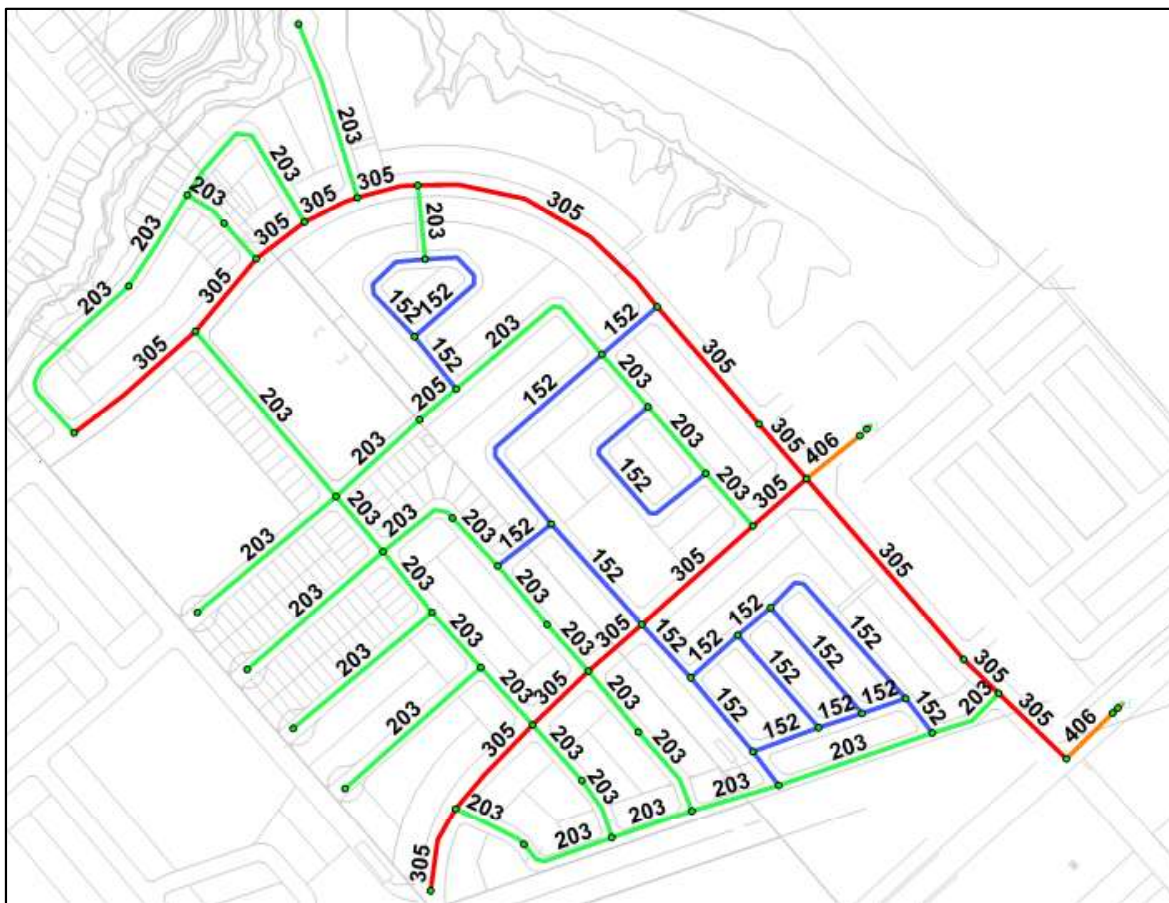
Proposed Pipe Layout and Sizing in Phase 1
